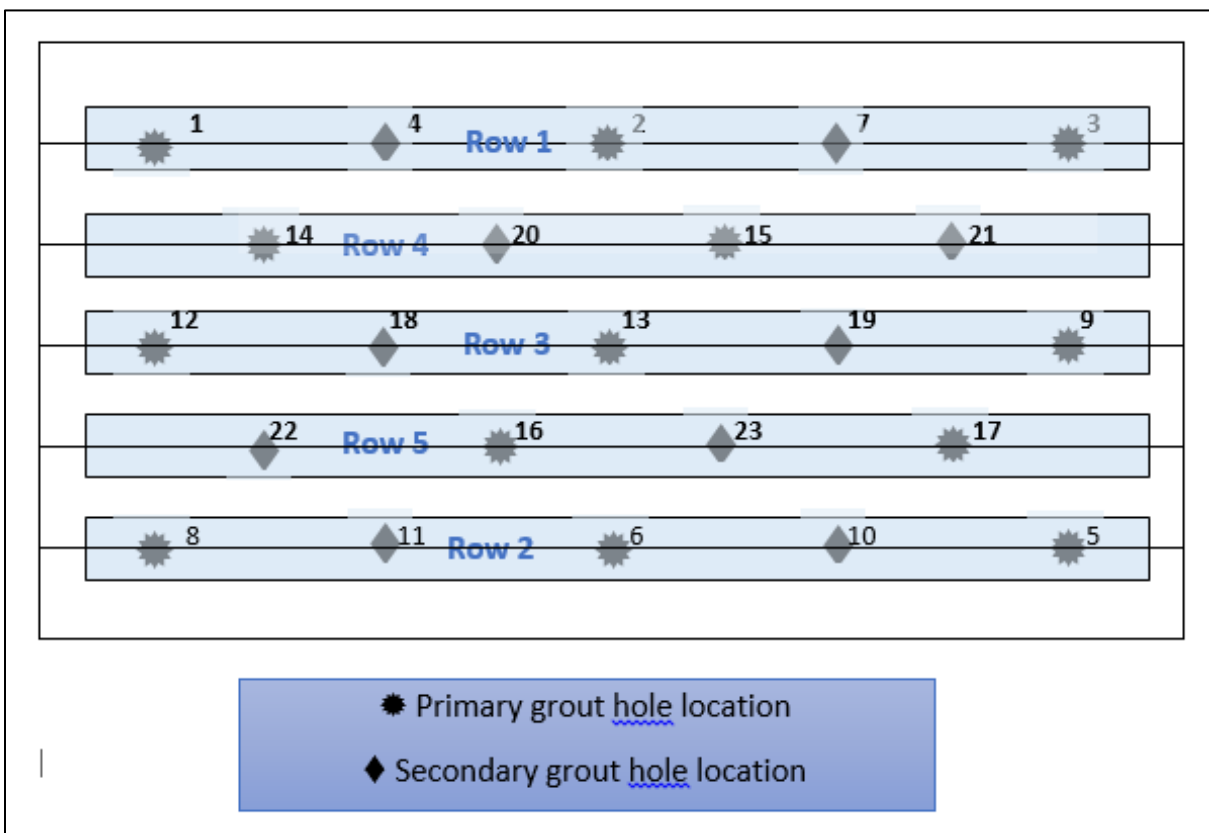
Typical Split-Spacing Hole Pattern (ASCE G-I 53-10)
